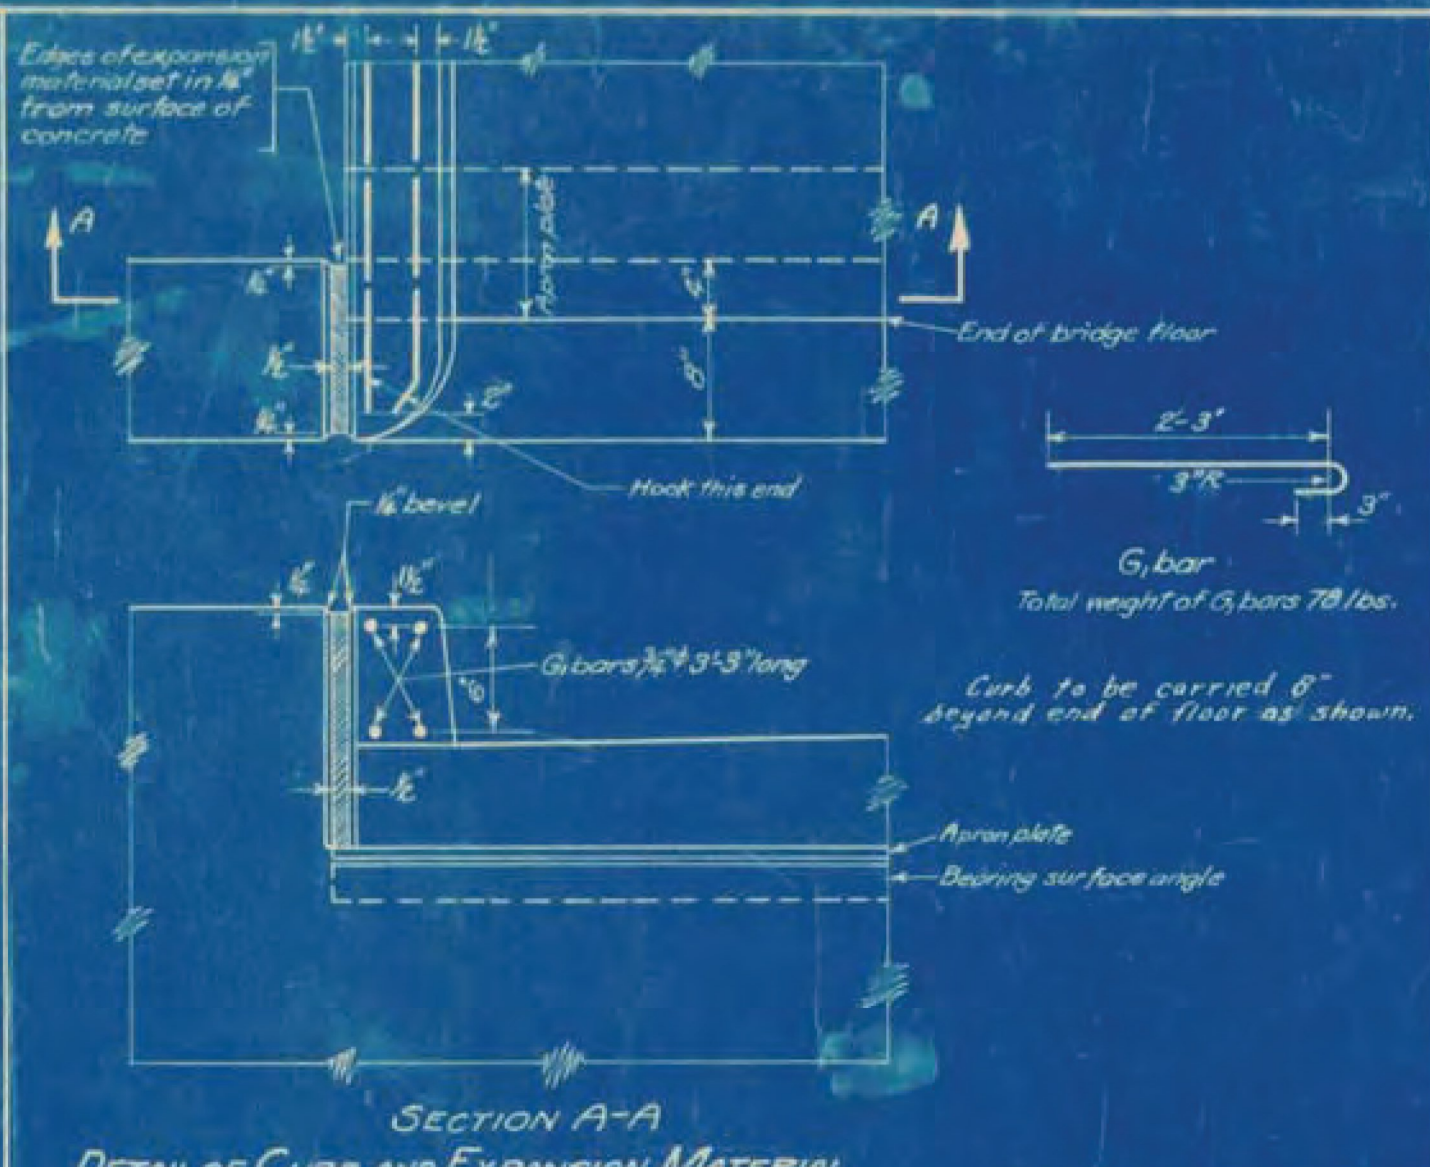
DETAIL OF EXPANSION MATERIAL FOR SLAB BRIDGES STANDARD DETAIL-5222
